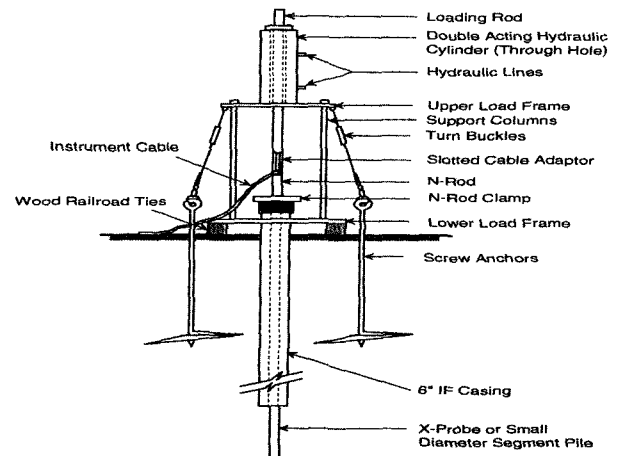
Schematic diagram of portable loading system (After Earth Technology Corporation, 1986)
